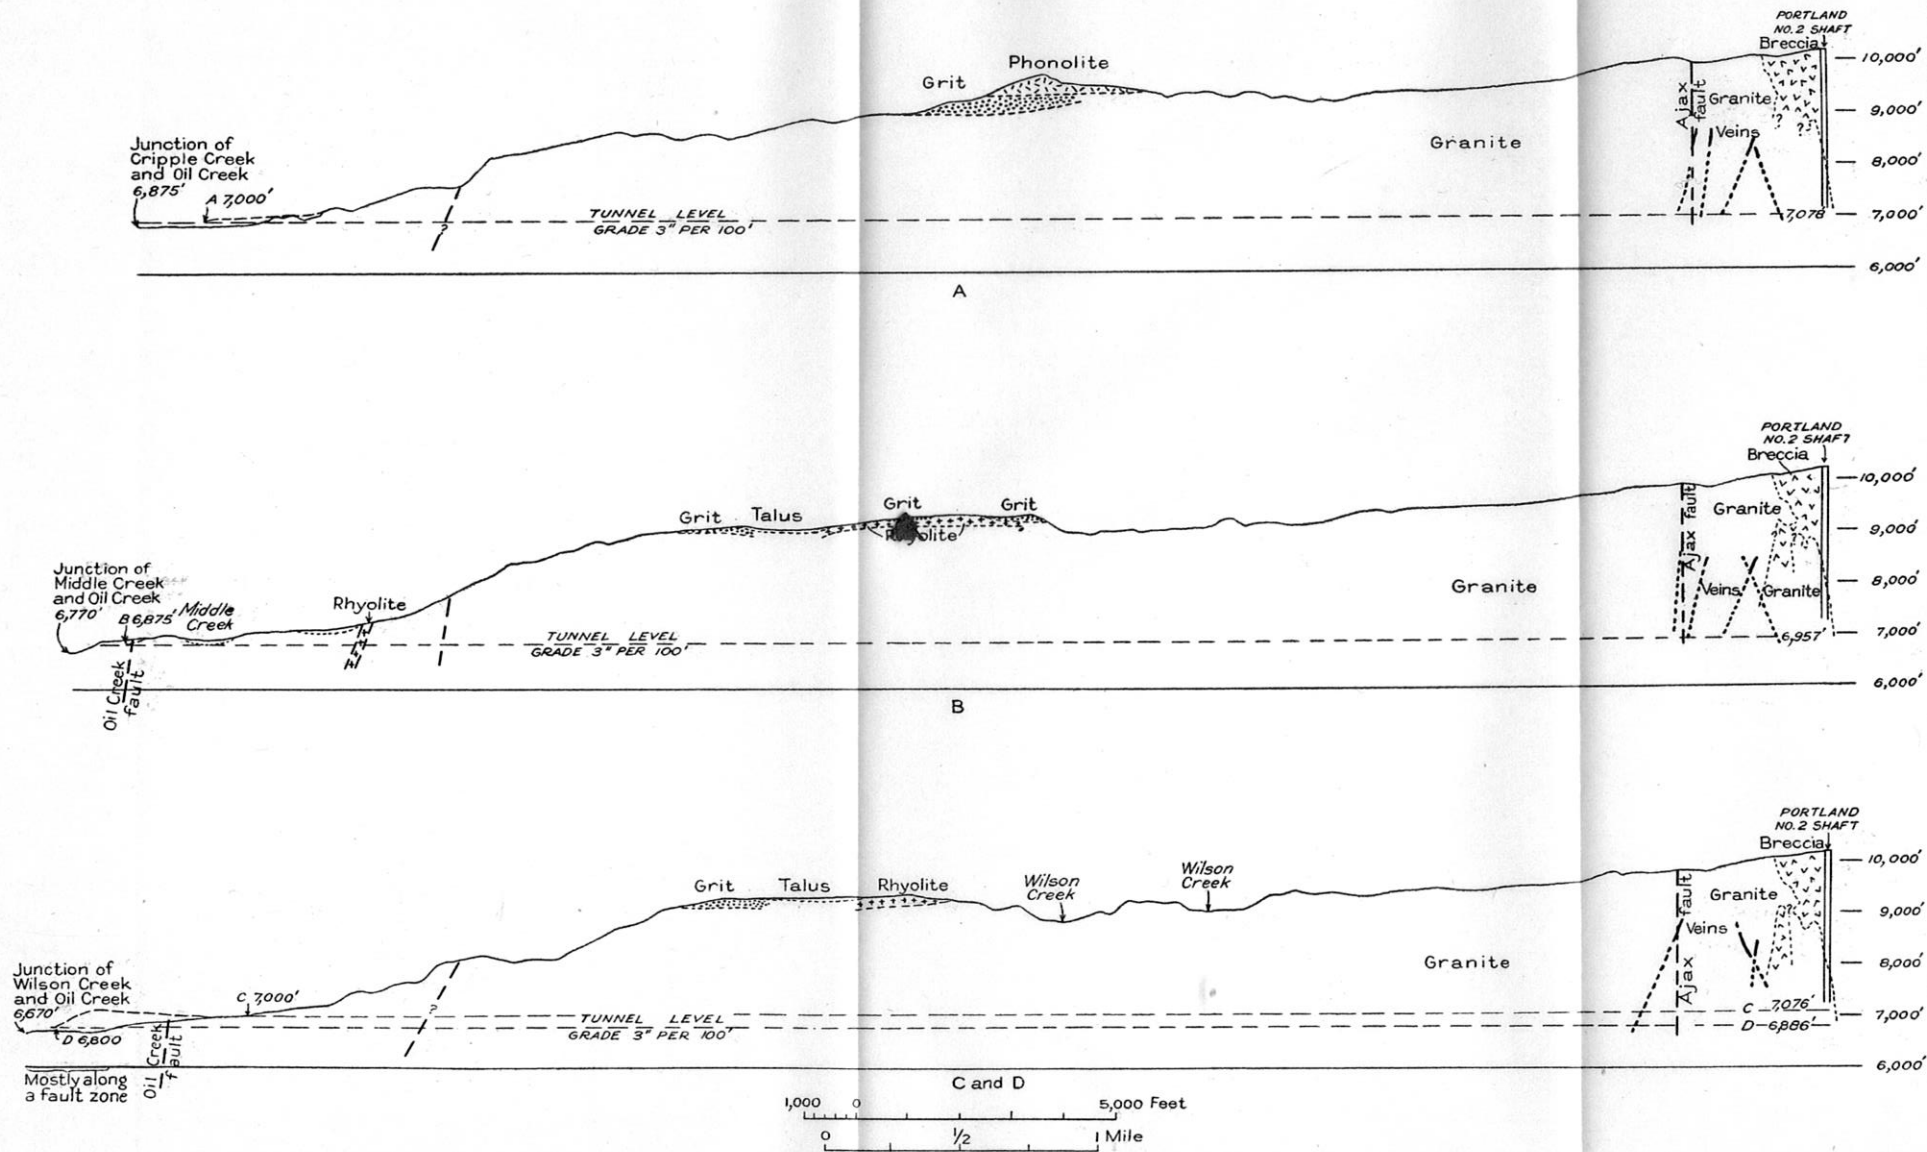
Longitudinal sections along proposed deep drainage tunnel sites.
